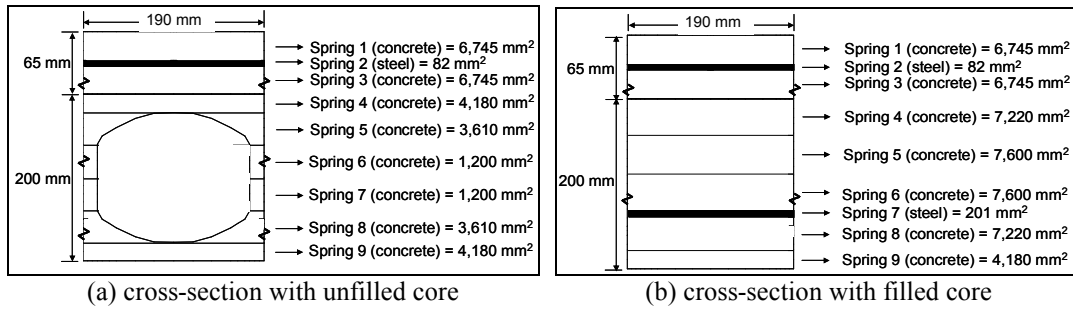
Division of the hollowcore slab cross-section for filled and unfilled core of current connection (white segment: concrete; black segment: steel)
